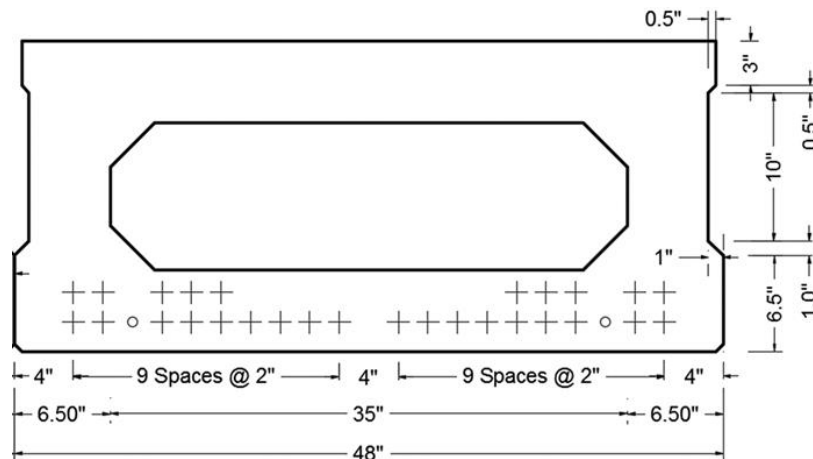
Revised Cross Section of B21-48 Box Beam that was Used in the Project
